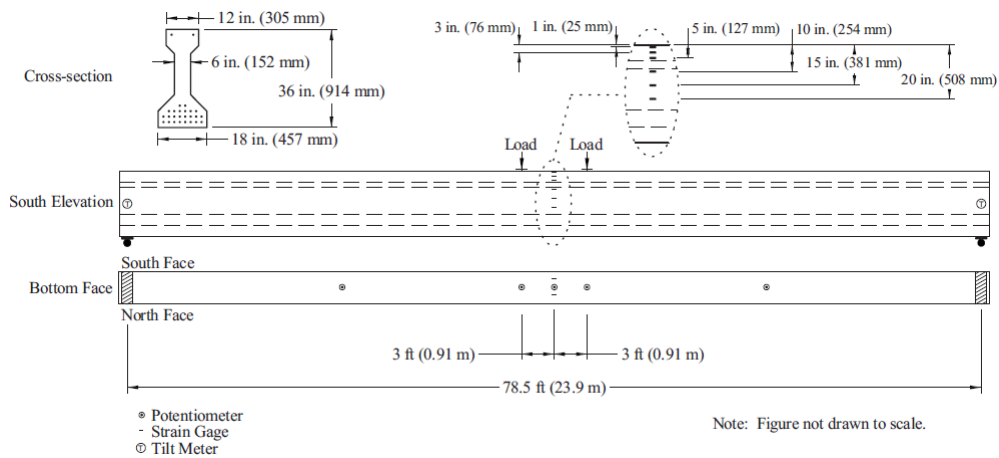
Cross section, loading configuration, and instrumentation plan [32]
